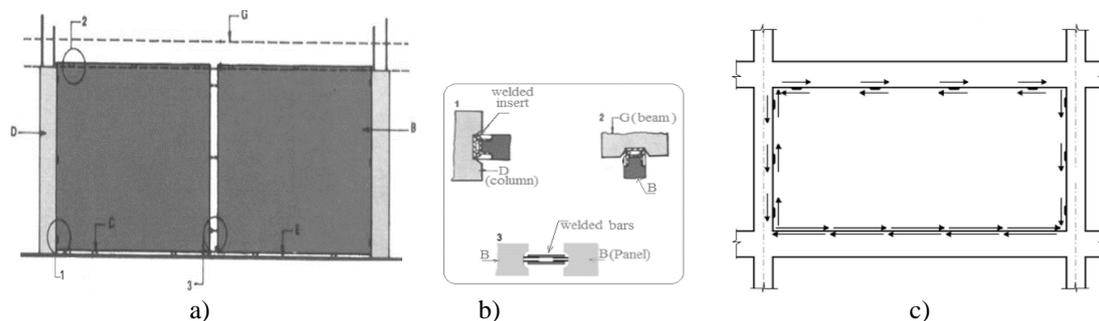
a) Dispositions of the inserts on structural elements, b) Detailed of the joints between shear walls and walls-frame, c) Shear walls behavior in the Girón system.
